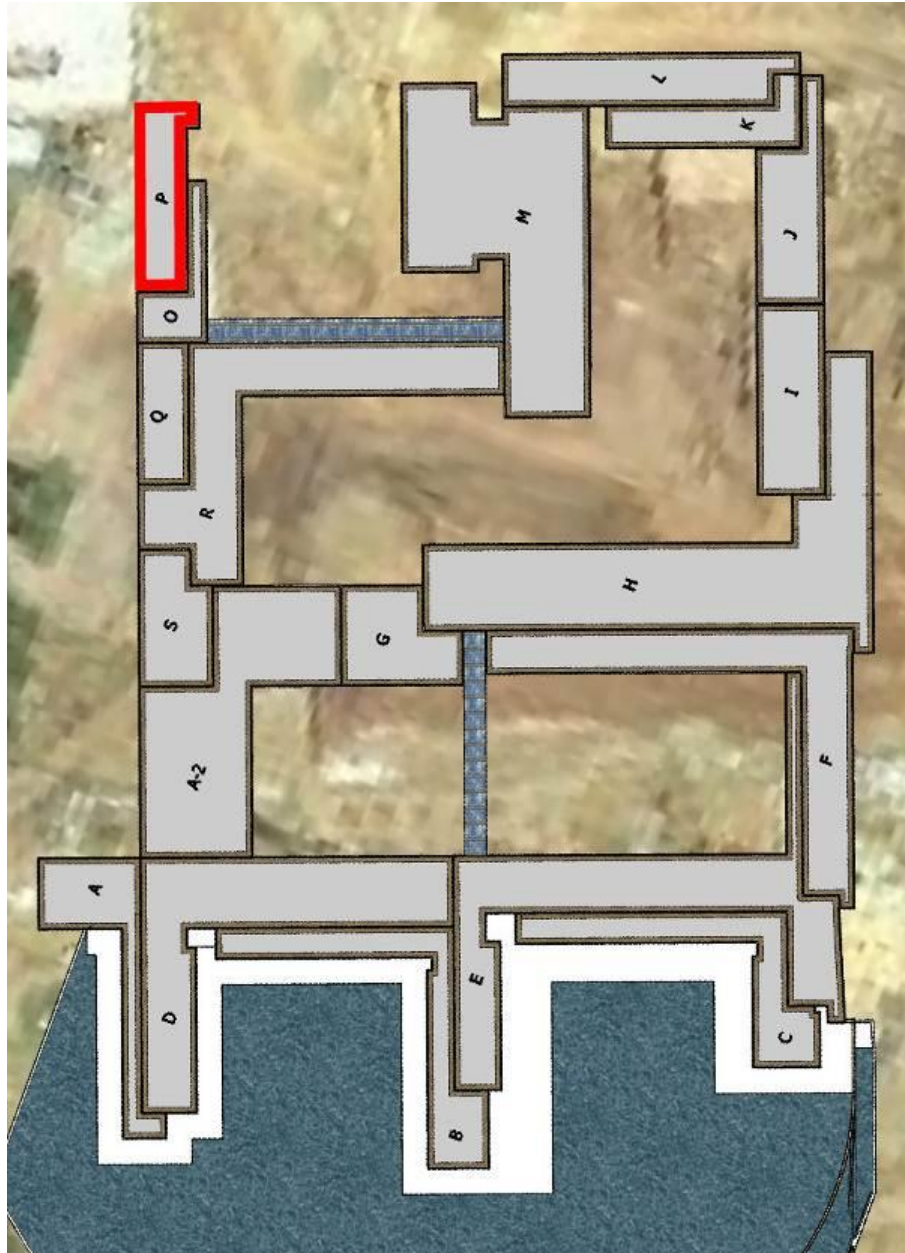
“Roof Plan Layout,” Roof P in upper left corner, illustrated by Author.
